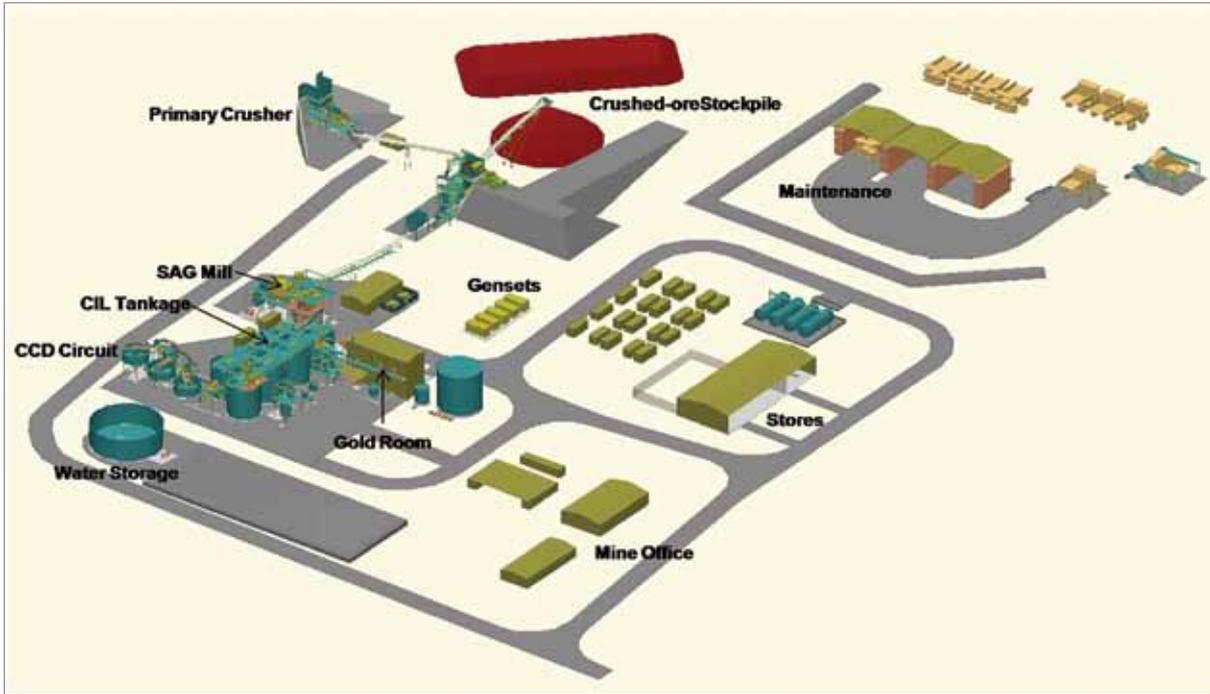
Layout of proposed Koka ore processing facility and mine support infrastructure.
